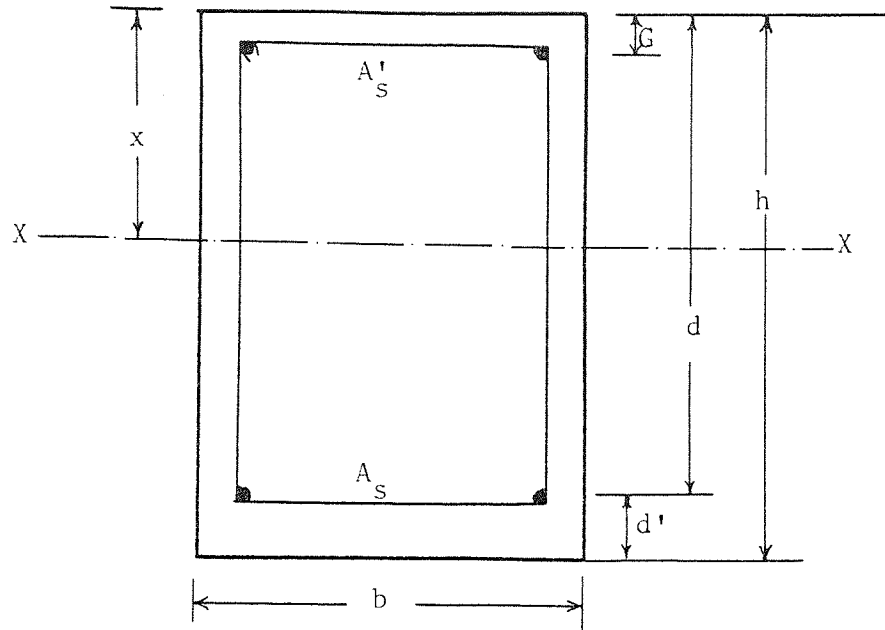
A TYPICAL RECTANGULAR BEAM SECTION
